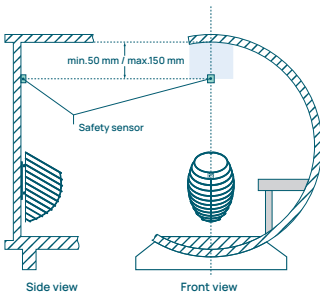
Installing the safety sensor on the wall in barrel saunas: wall-mounted heater
